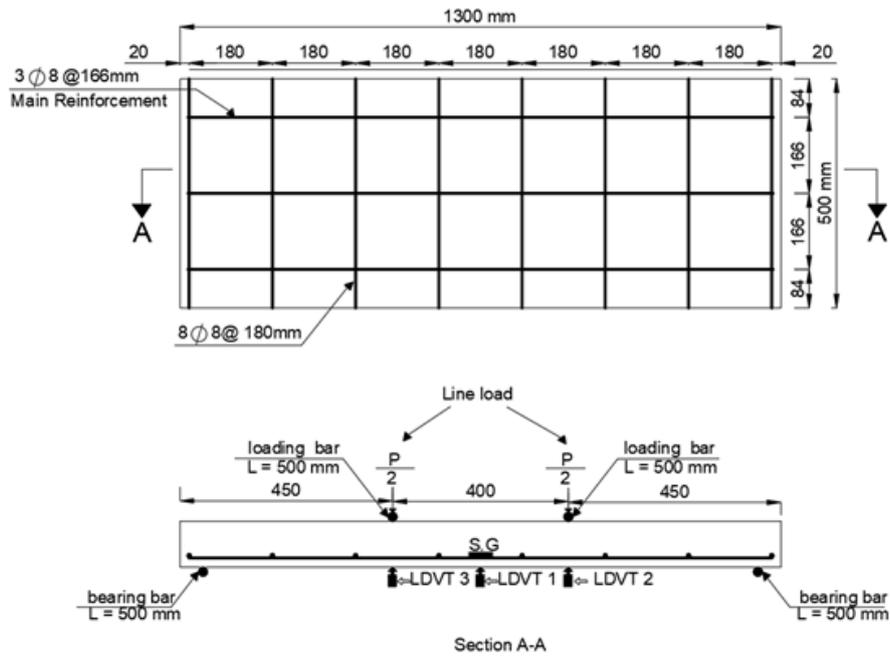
The experimental specimen: dimensions, reinforcement details and test setup.
